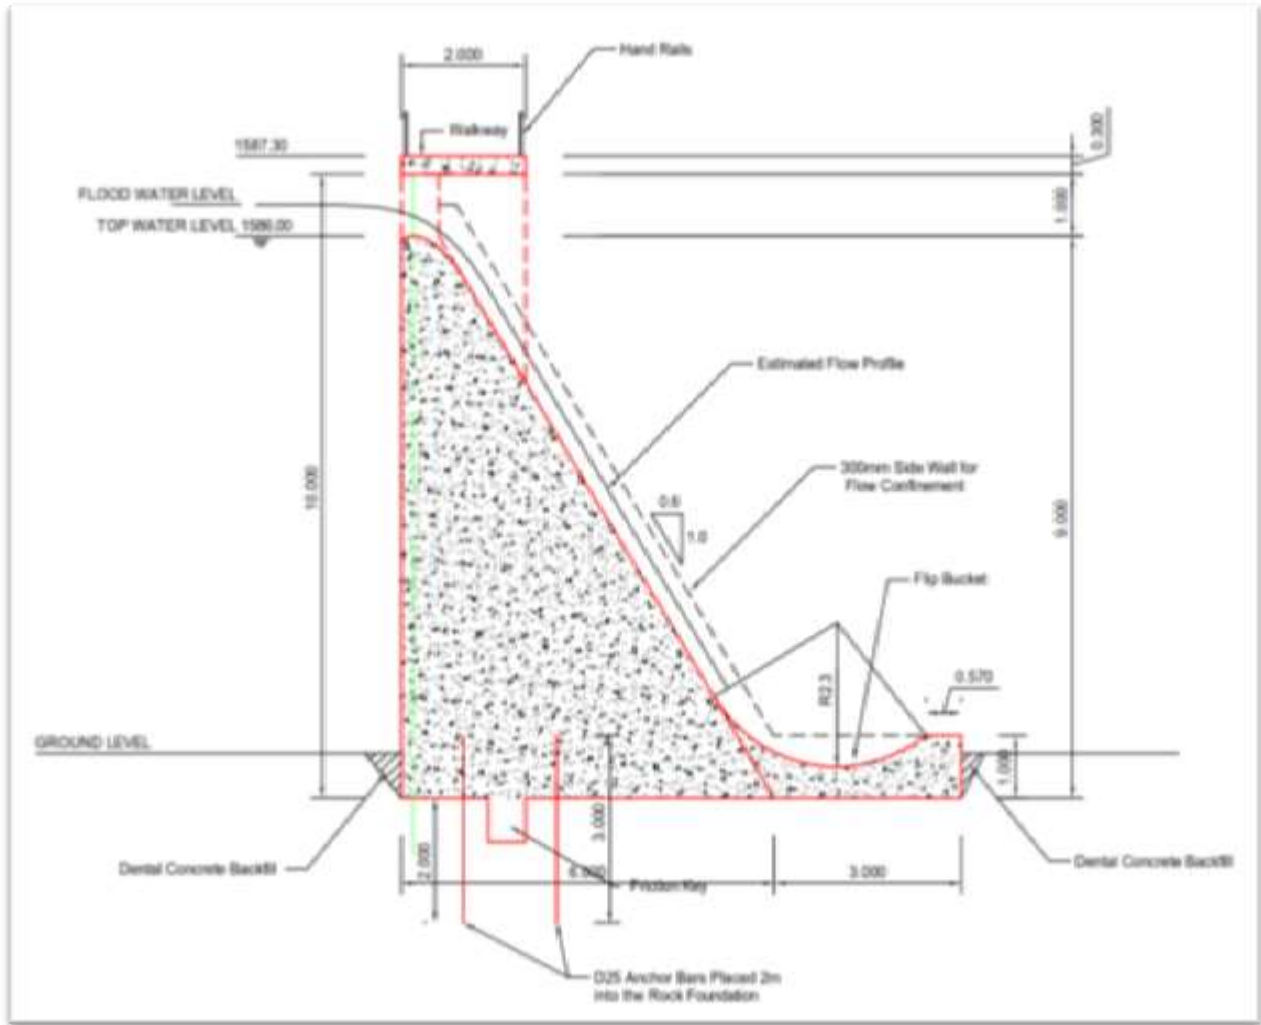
Typical Section for the spillway Overflow Section (showing the walkway at the top)
